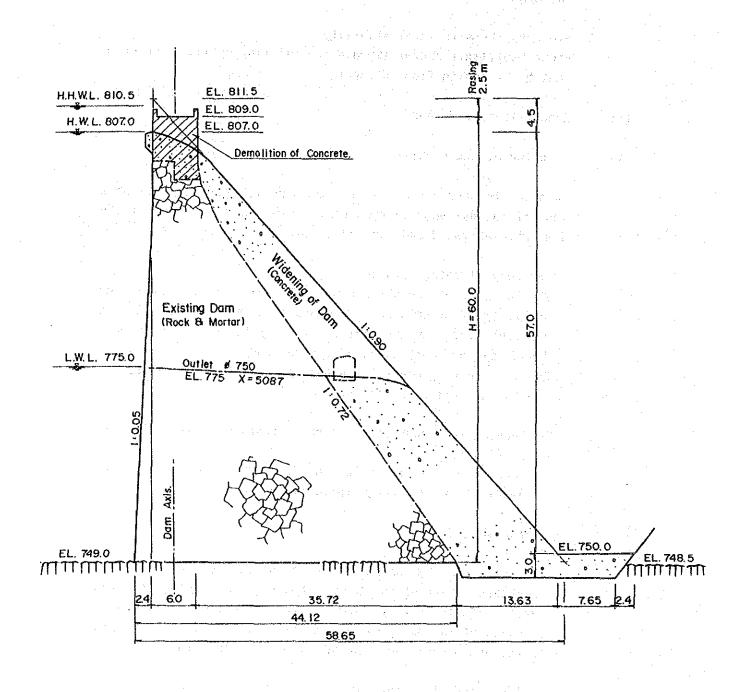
Typical Cross Section of Dam Rehabilitation Plan
